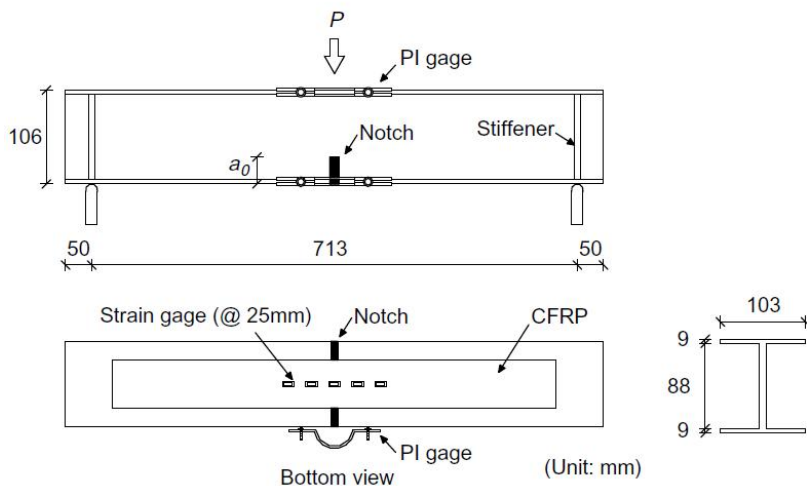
Test beams and test setup by Kim and Brunell (2011).
